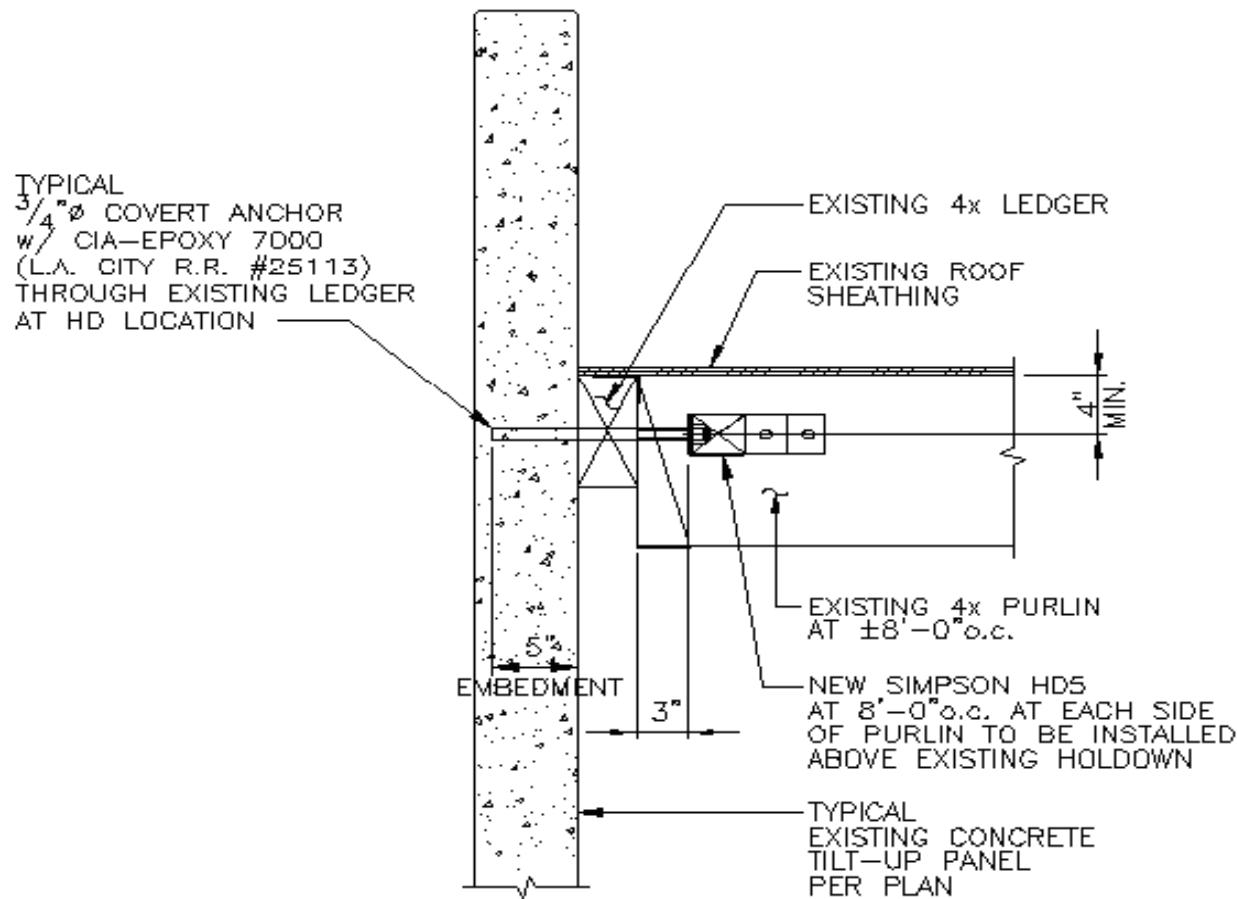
TYPICAL PURFLIN TO EXISTING CONCRETE CONNECTION DETAIL
